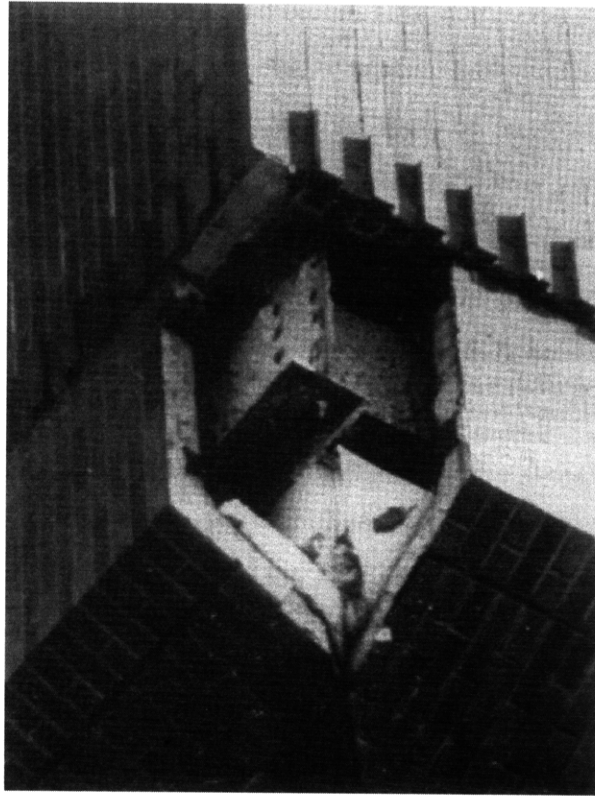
Cracking and failure in the masonry cladding caused by corrosion (Chicago, 1990)
